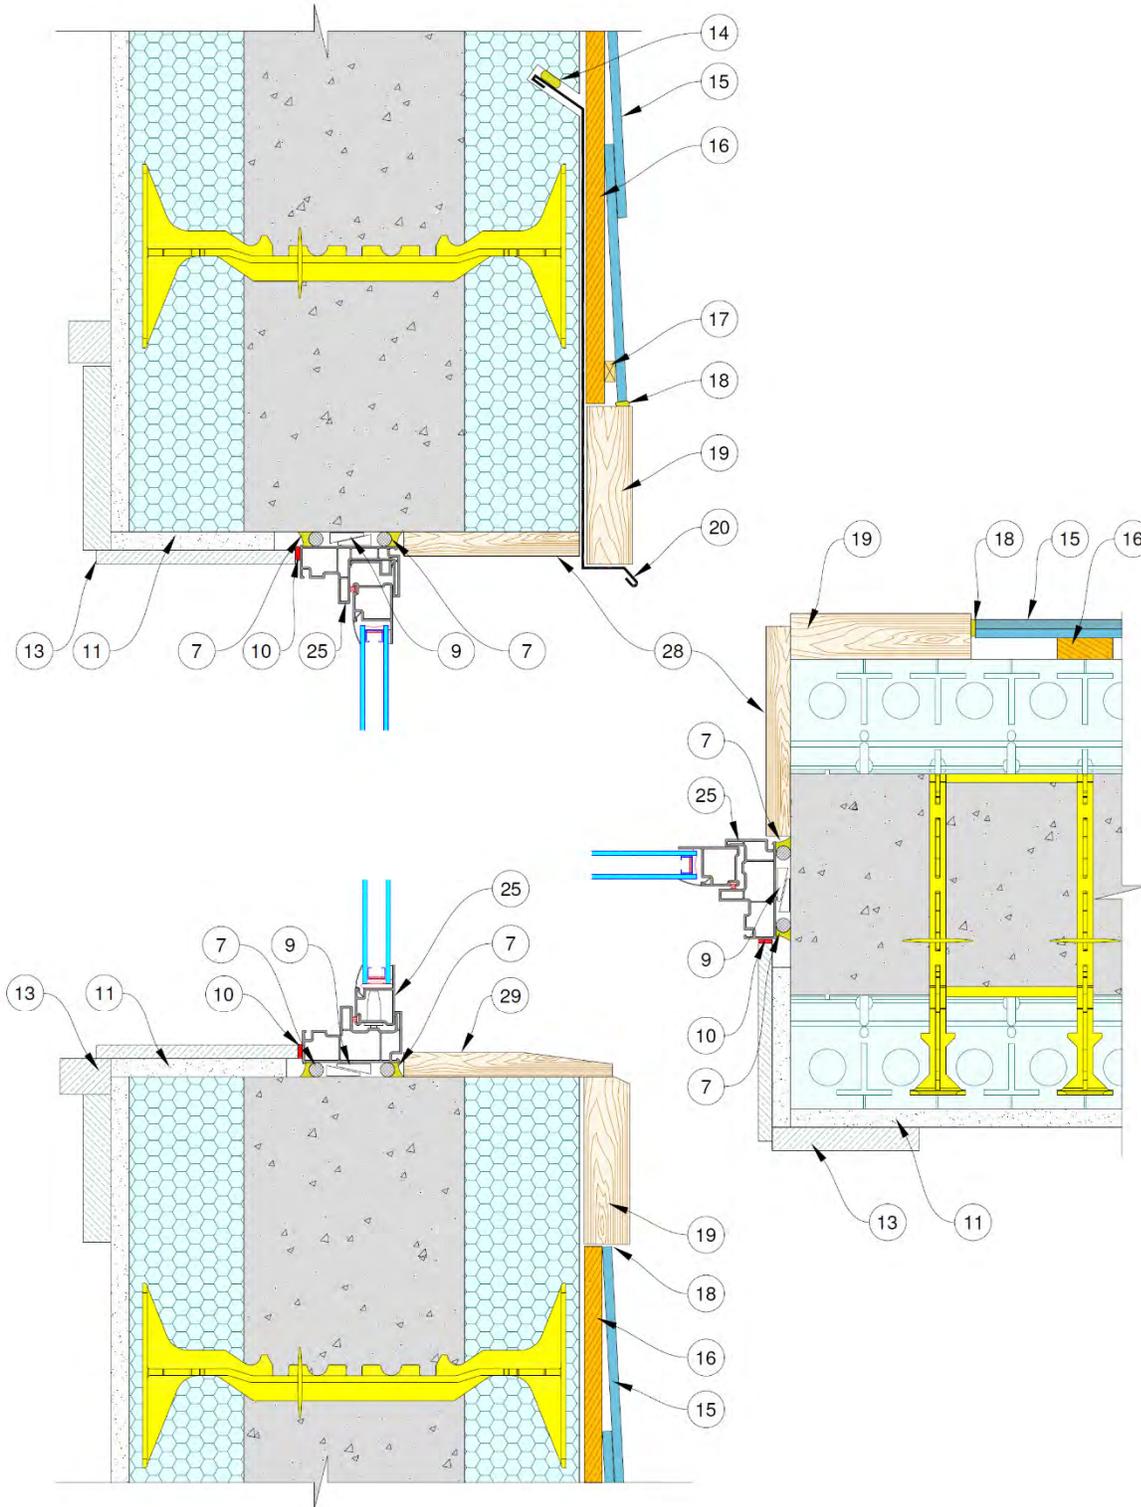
ICF Window Assembly - Direct to concrete, Boxed window centered, Lapped siding
